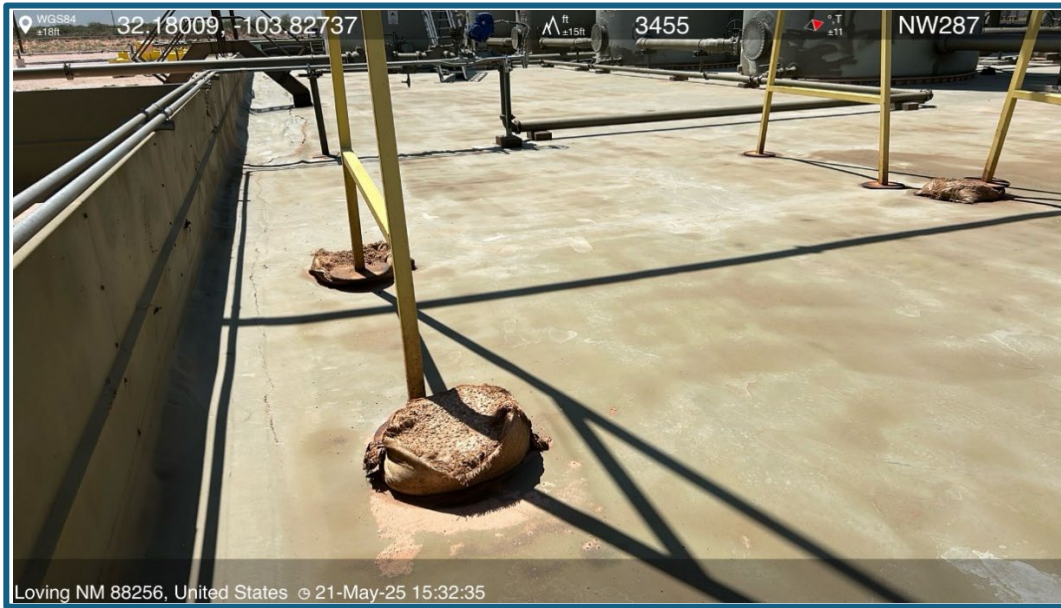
/21/2025	Direction Facing	northwest	Photo 8
